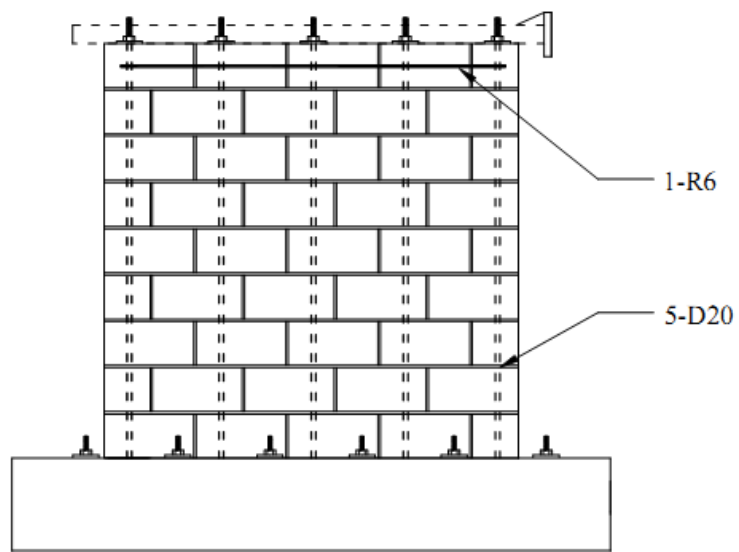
Reinforced masonry wall A2 tested by Voon (2007)
